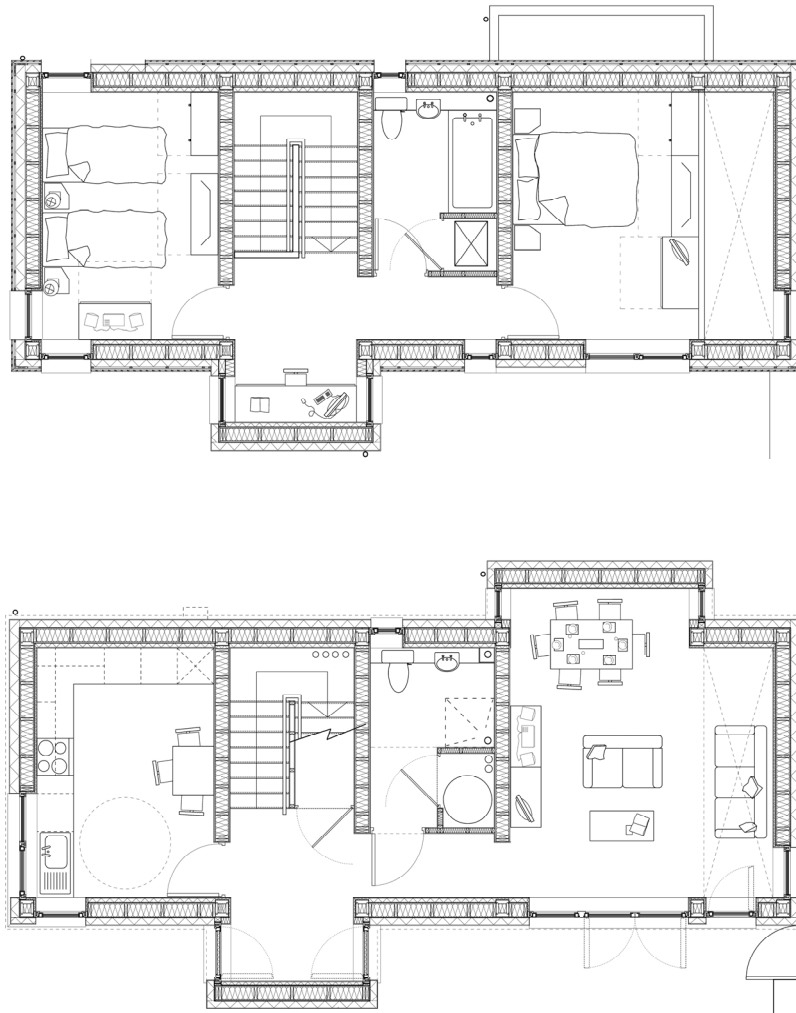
Upper and ground floor plan showing spatial arrangement
